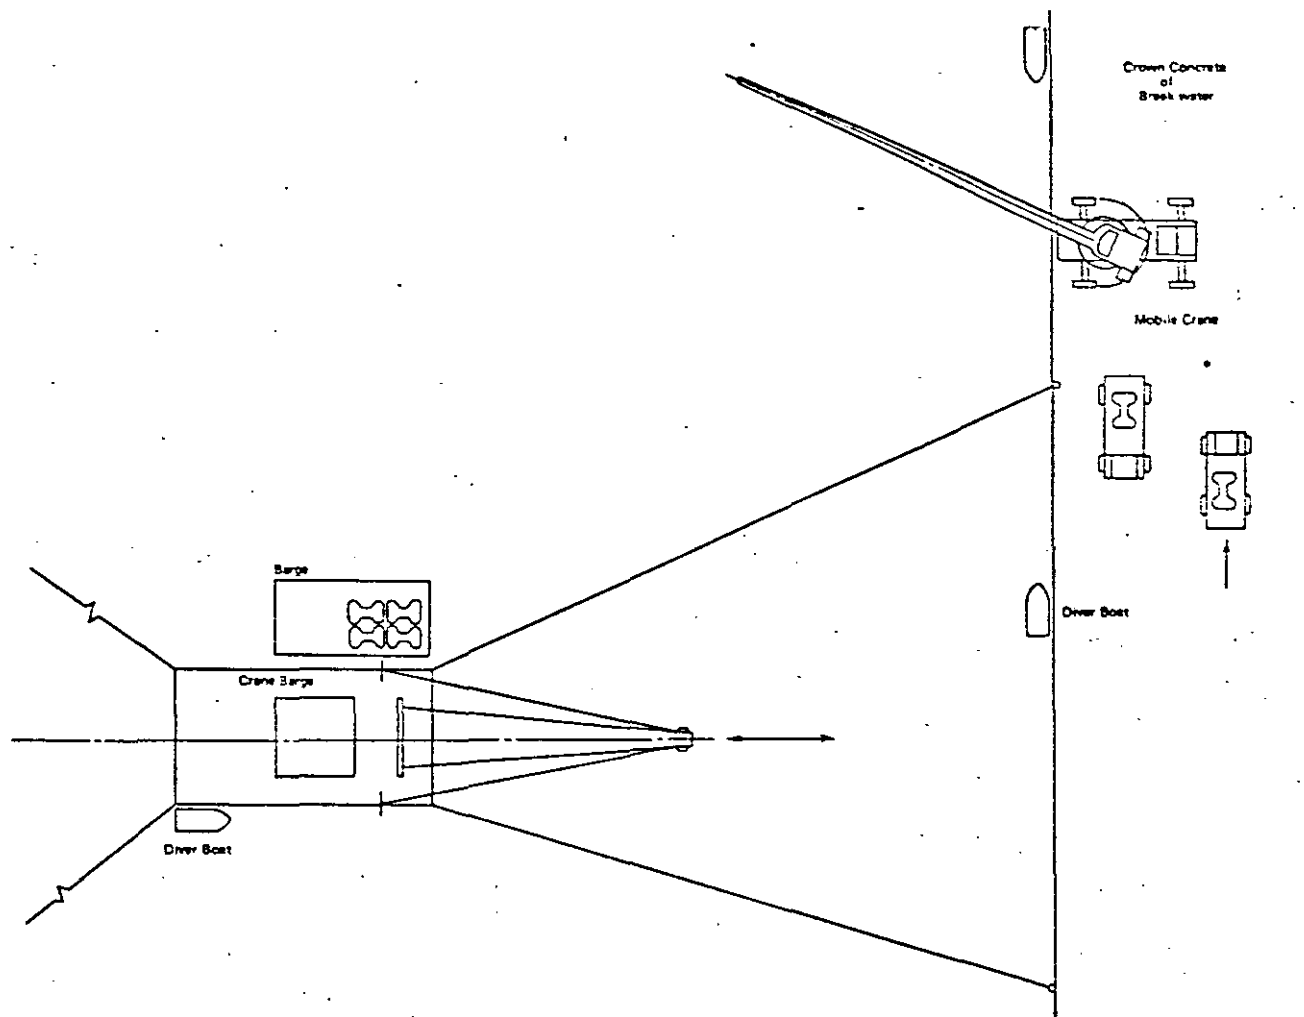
Example, Setting Works of Armour Concrete Block
